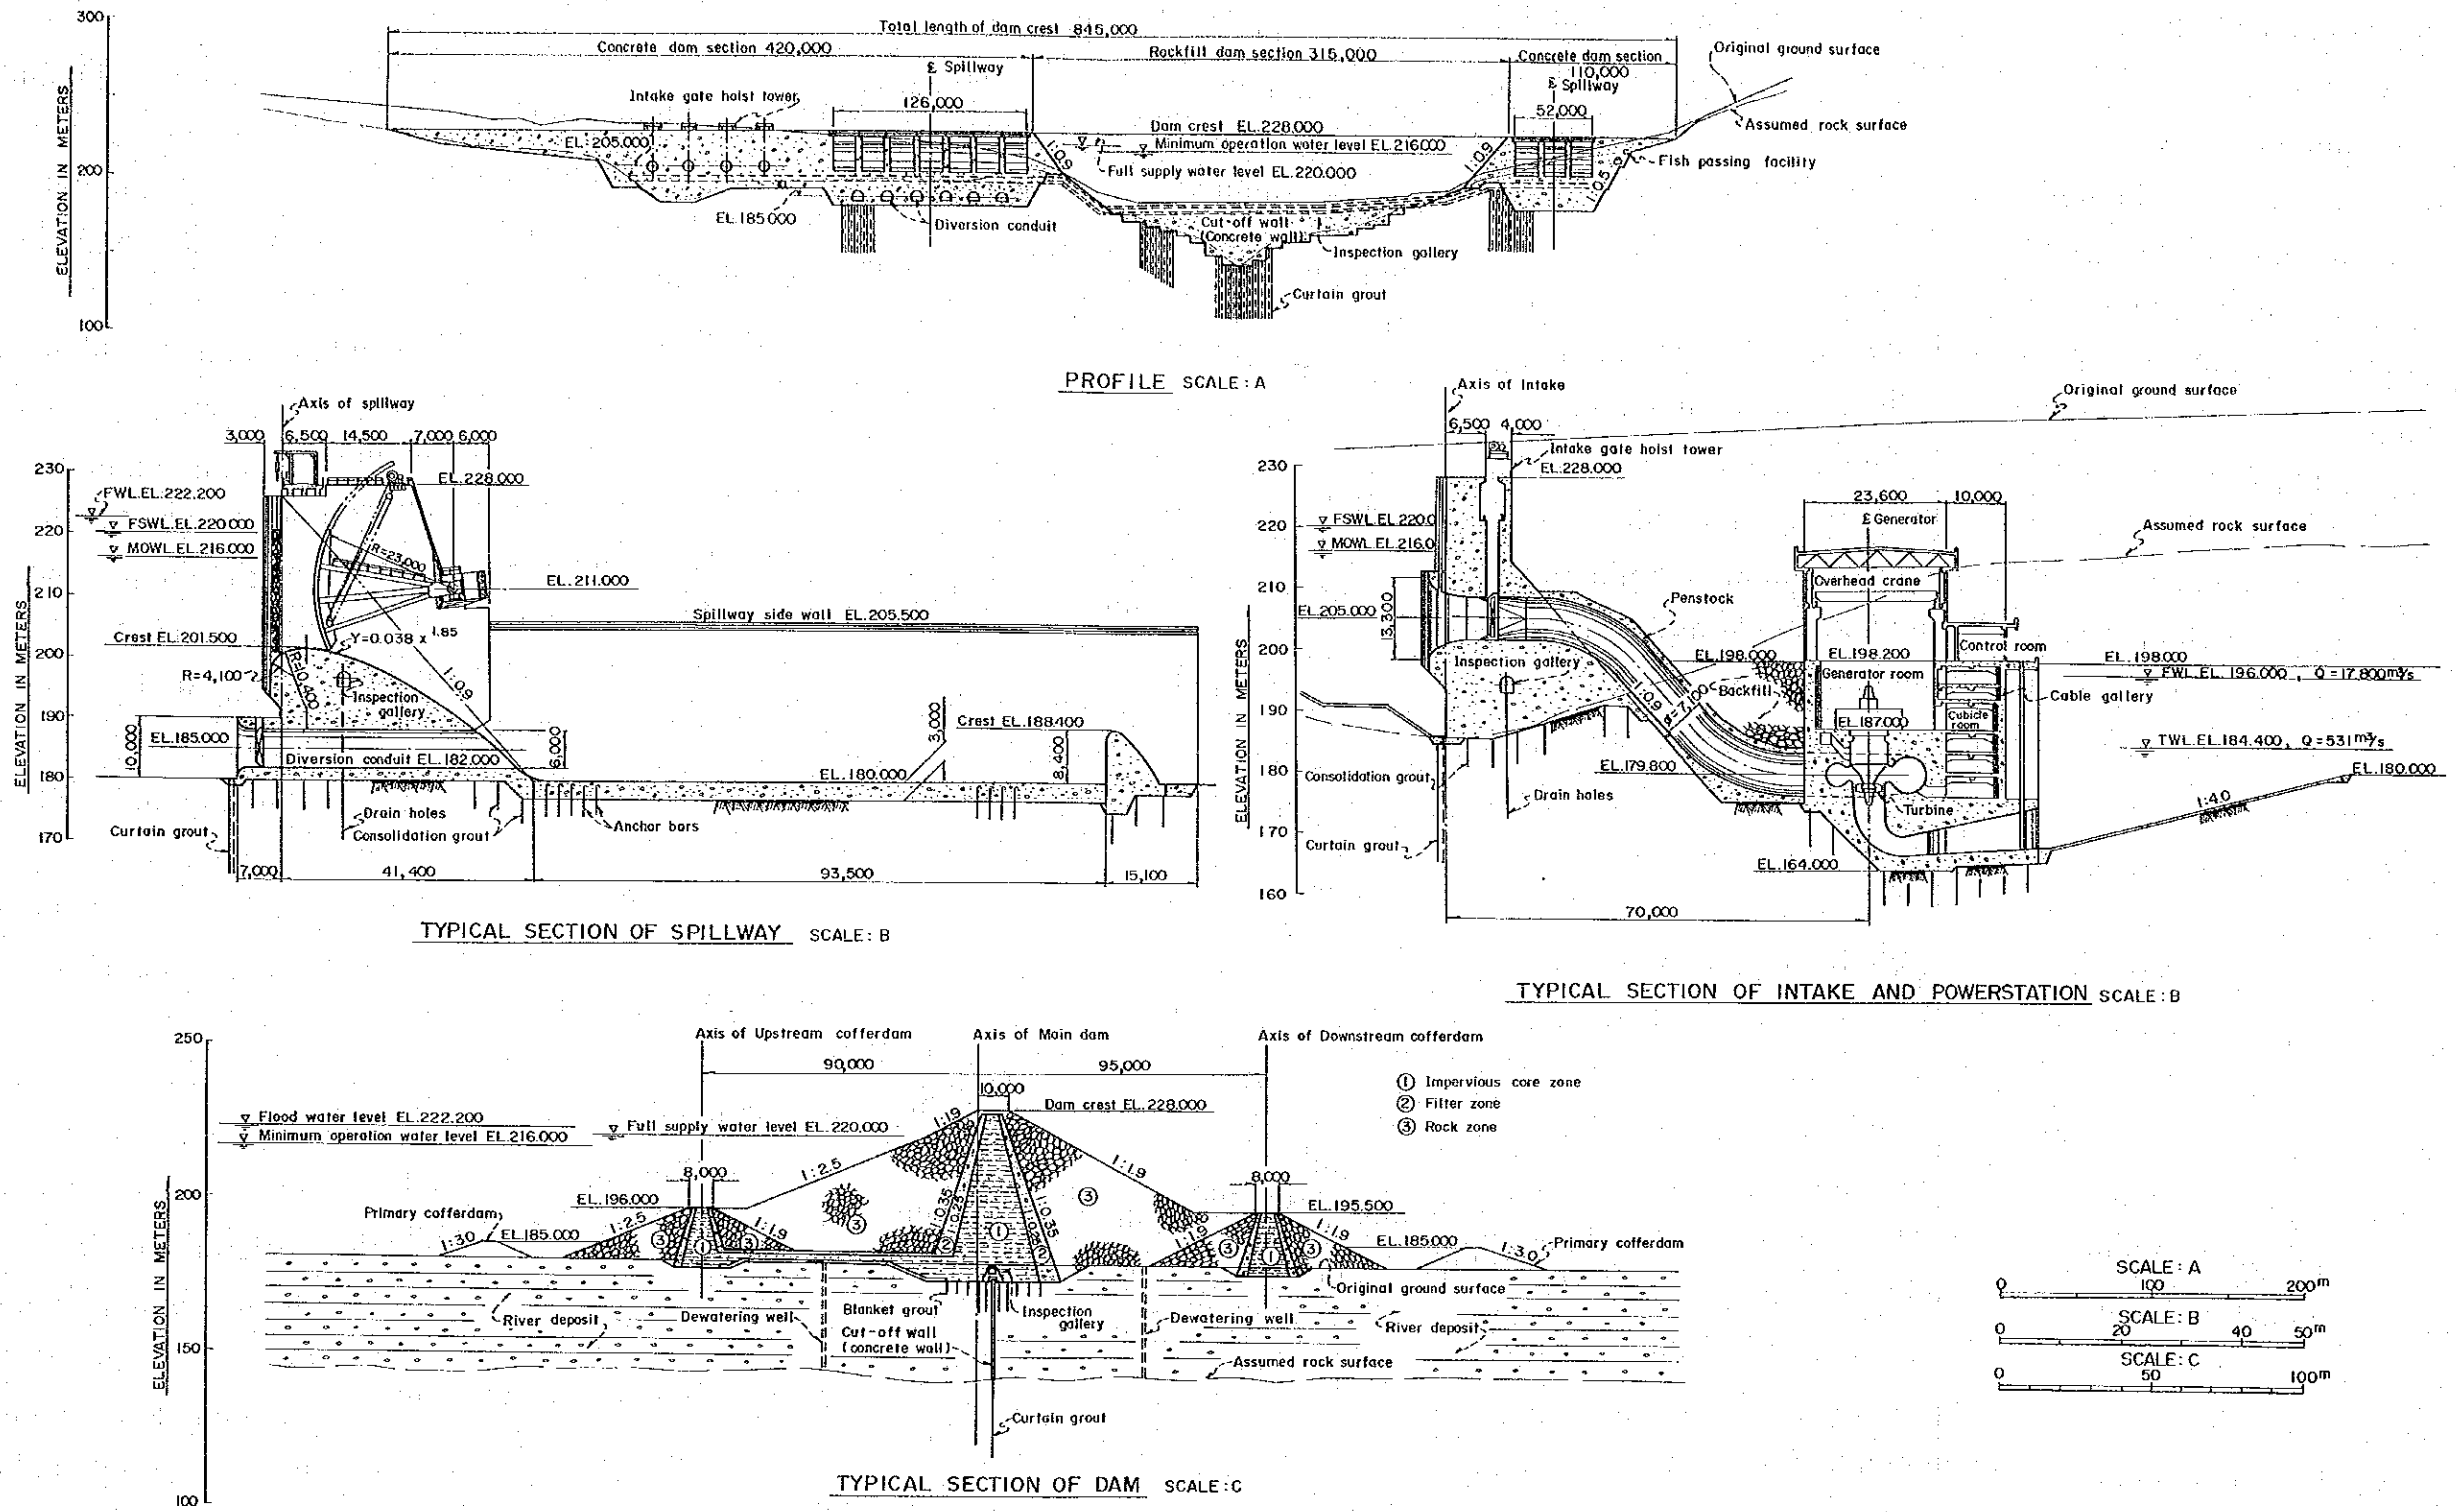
SECTION AND PROFILE(SCHEME : FILL DAM, DAMSITE-A, F.S.L 220, 150MW INSTALLED CAPACITY)
